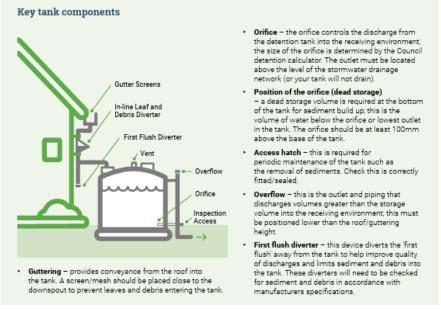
Typical Rainwater & Stormwater Tank¹⁴
